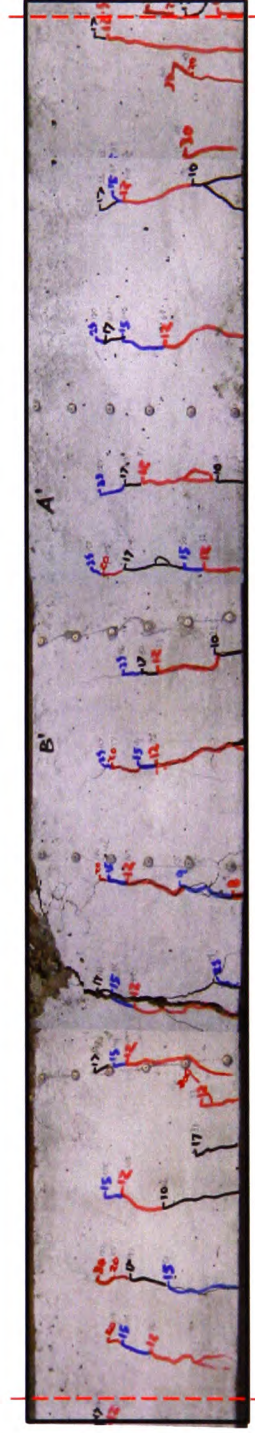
(c) – Photograph of crack pattern for 8CON within constant moment zone at failure
